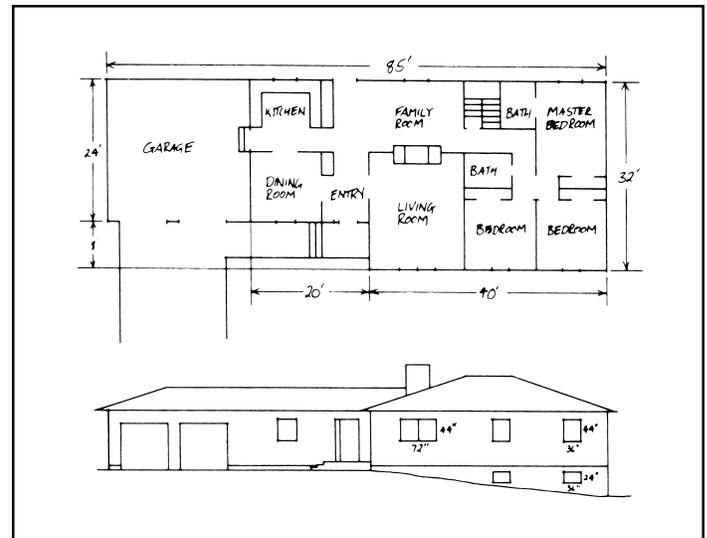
Sketch the floor plan of your house, noting dimensions, window locations and the south facing wall.
